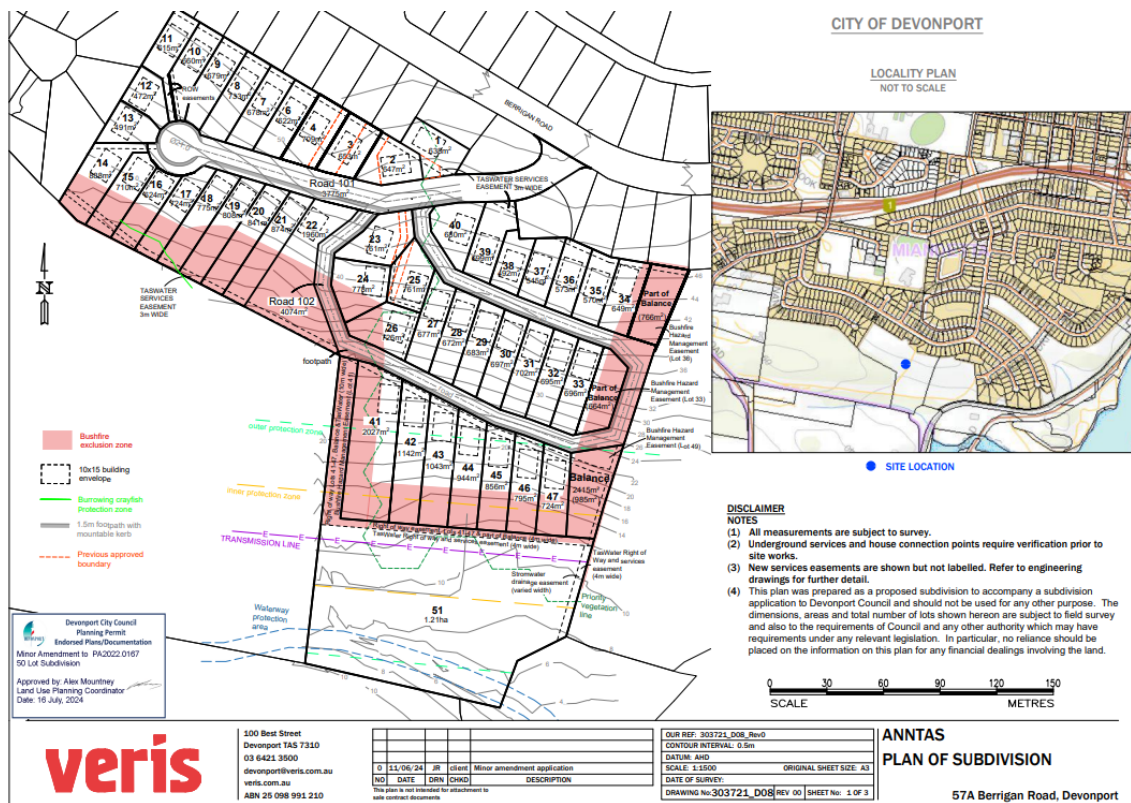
Plan of subdivision Ref: Permit PA2022.0167
